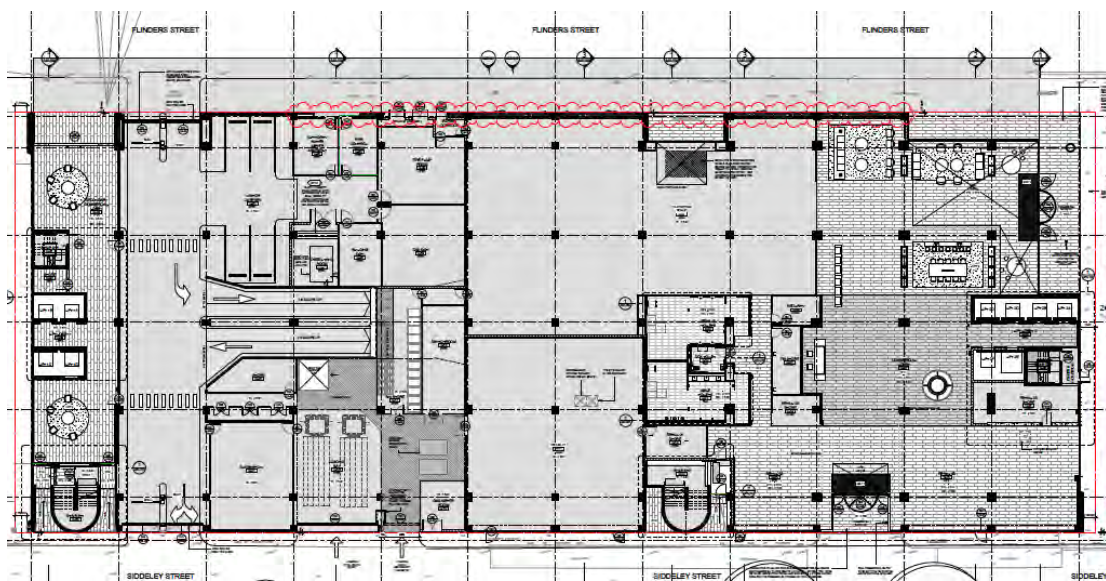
Proposed Ground Level Plan. From Drawing A21-001
